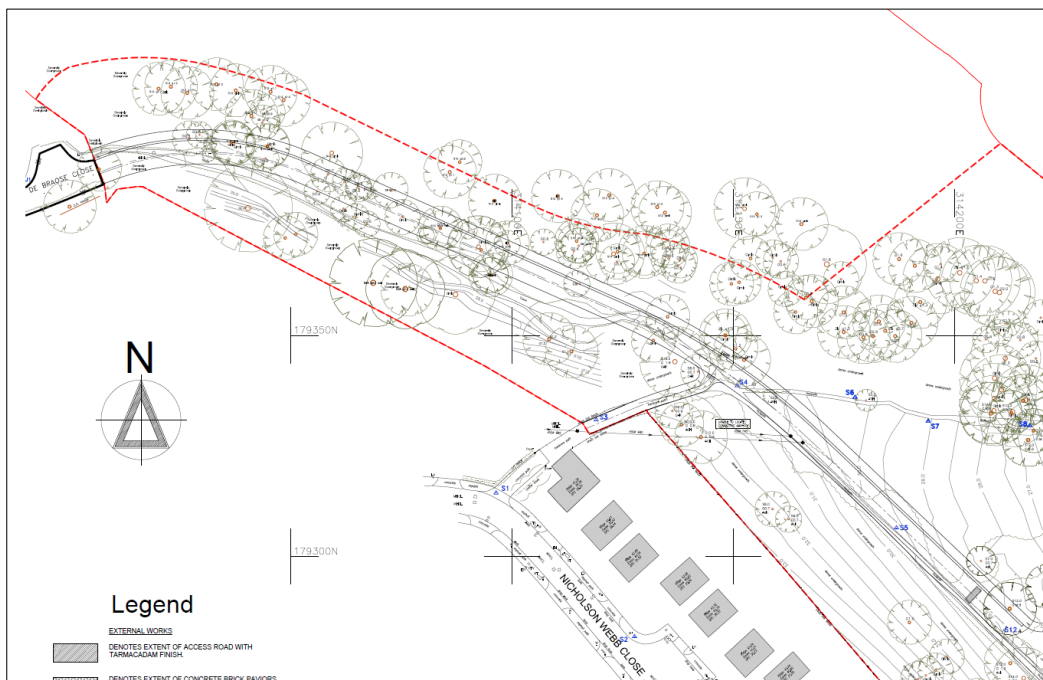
Extract from Site Layout Plan showing Proposed Access Road from De Braose Close
